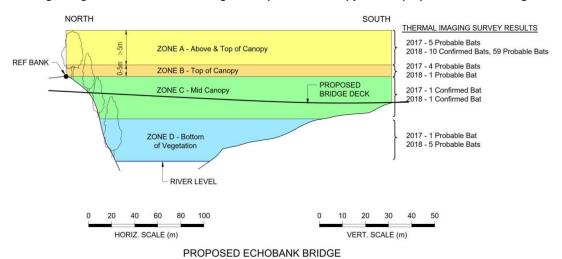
Bat flight height in relation to the existing bank top and tree canopy and the proposed Echobank Bridge.
